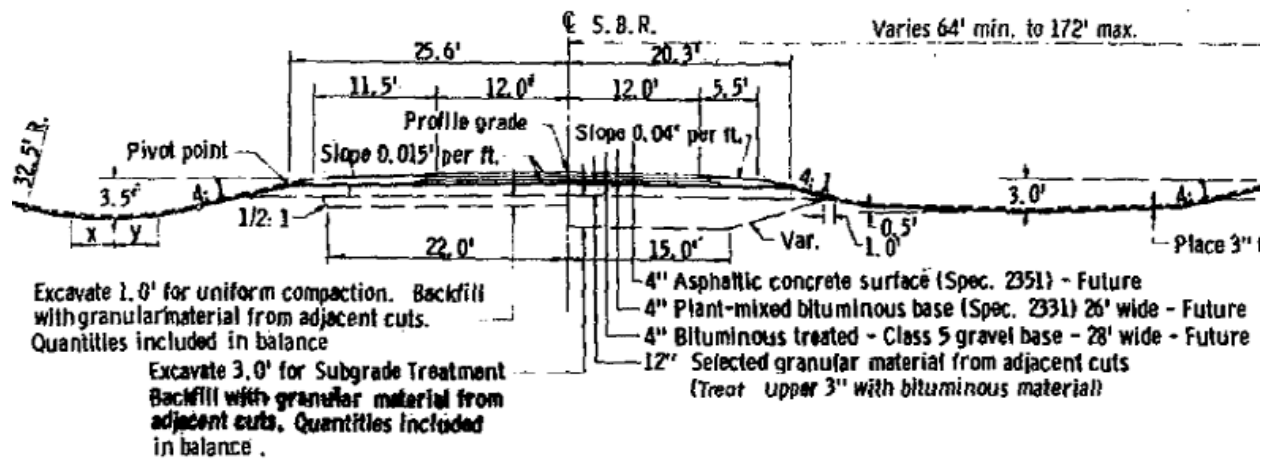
I-35 mainline typical section (1964 construction plan)
